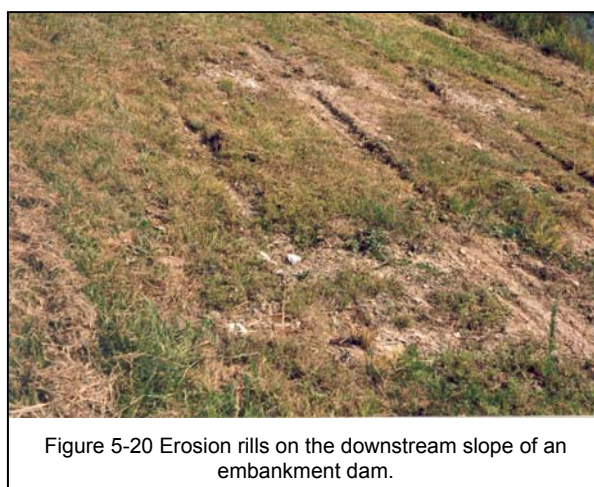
Erosion rills on the downstream slope of an embankment dam.
